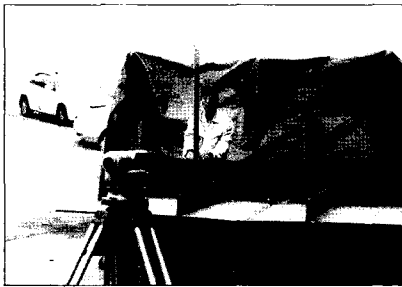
Final deformed shape after welding and deformation measurement
